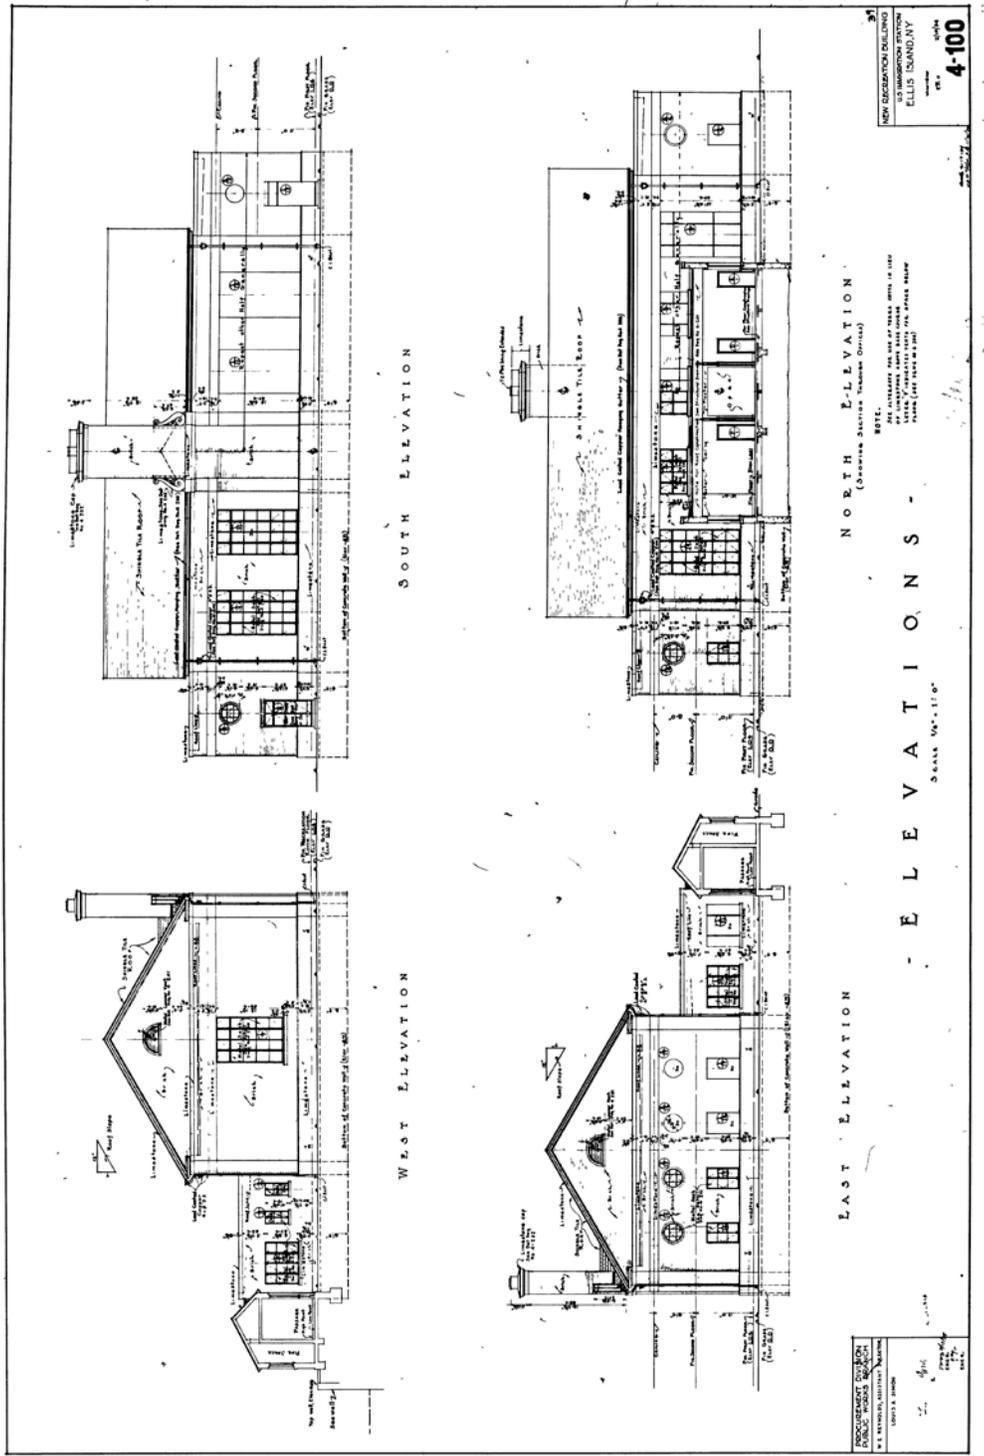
Elevations, New Recreation Building, Drawing No. 4-100, 18 February 1934.
